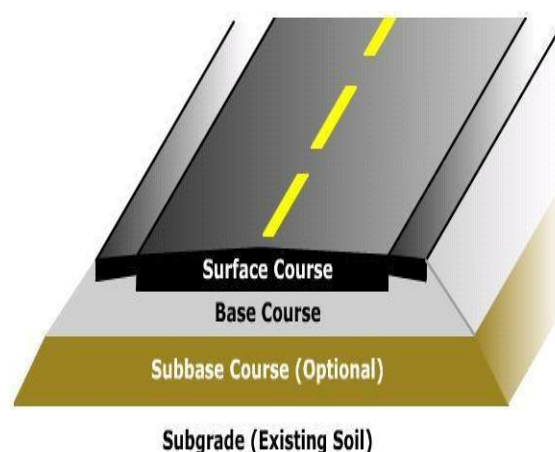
Typical cross section of the layered system in conventional Flexible pavement
